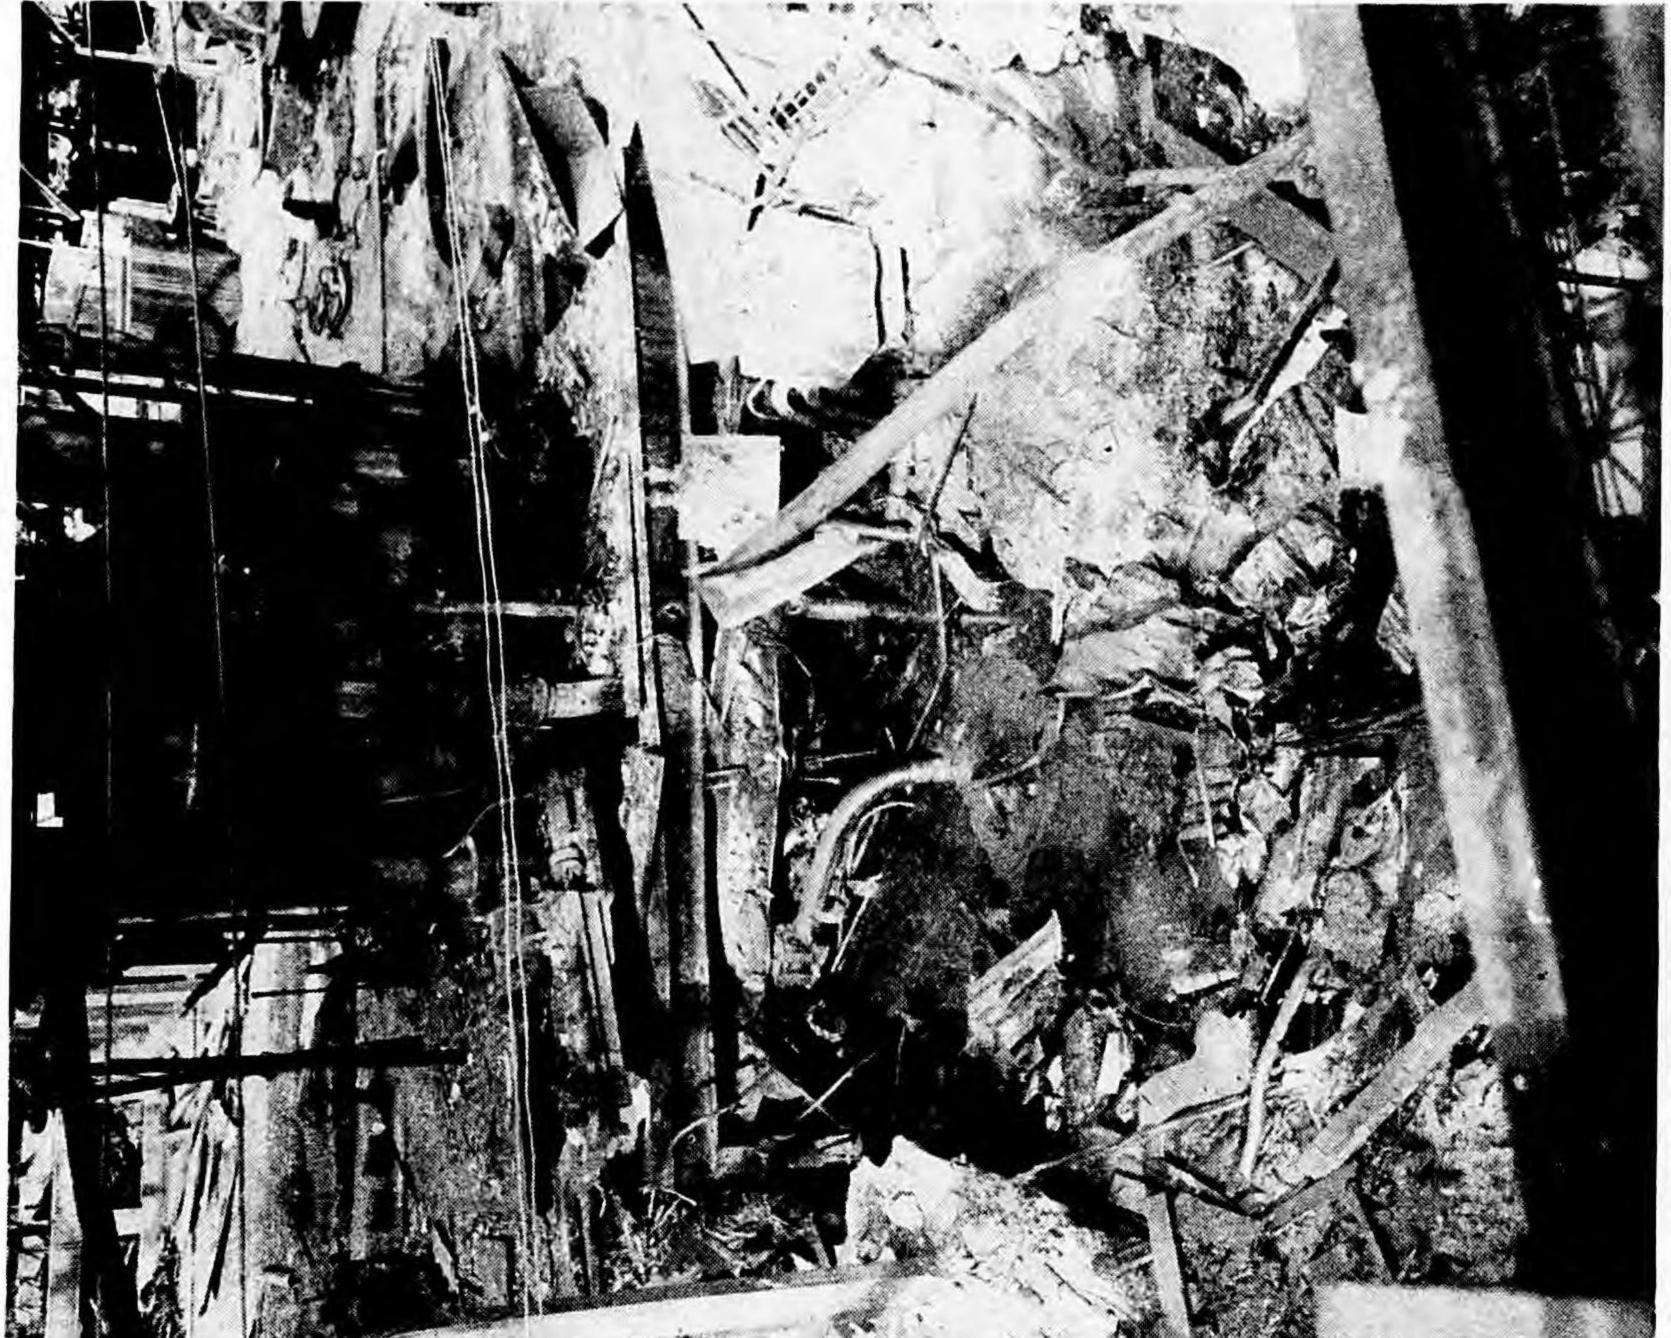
Building 301b; roof damage between Columns E12 and E11 looking N.
